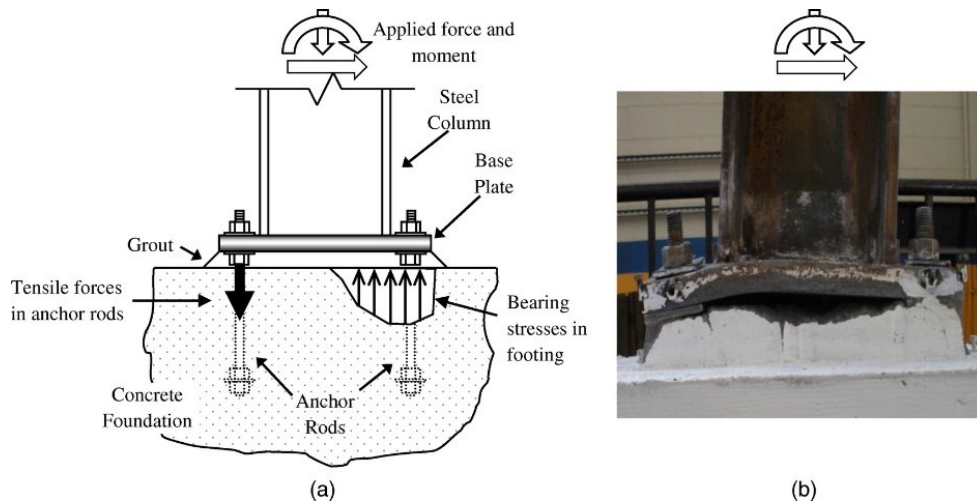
Failure of the base plate due to the formation of a plastic hinge in the plate and concrete spalling (Torres-Rodas *et al.*, 2016 [54]).
